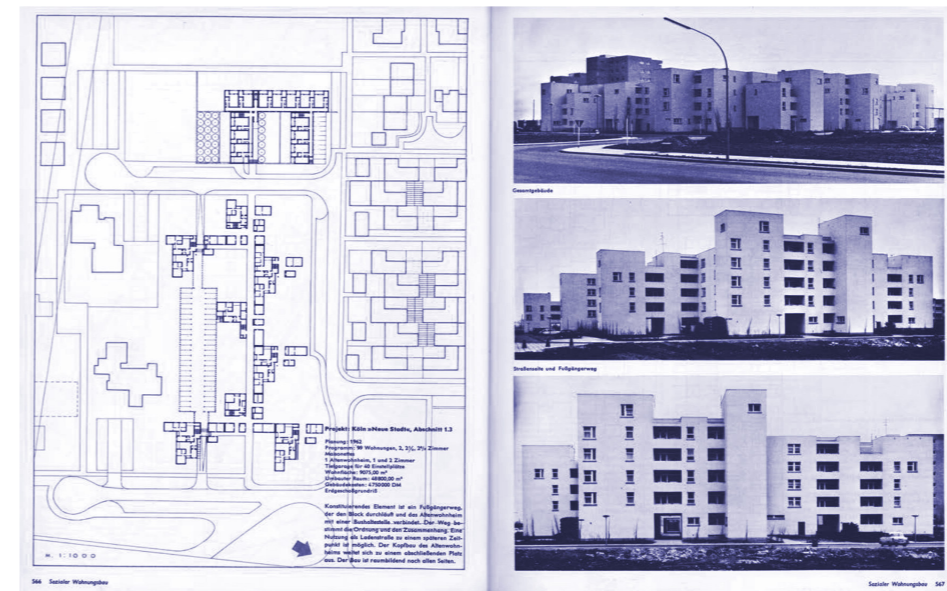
General plan and photo from the street and the inner courtyard (1963) (Oswald Mathias Ungers. O. M. Ungers. Sozialer Wohnungsbau 1953-1966. In: *Baumeister*. 1967, issue 64, pp. 566- 567).
